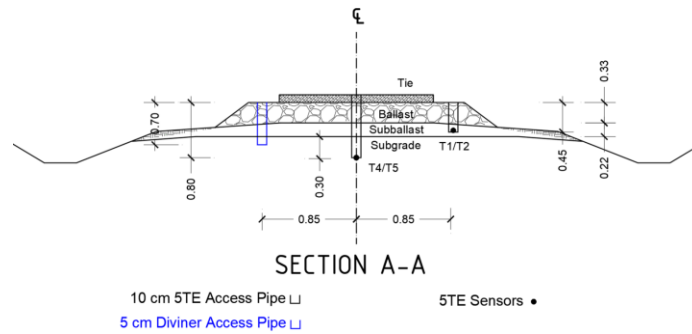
Cross-section of control site setup: access pipe at subgrade layer (dimensions in meters).
